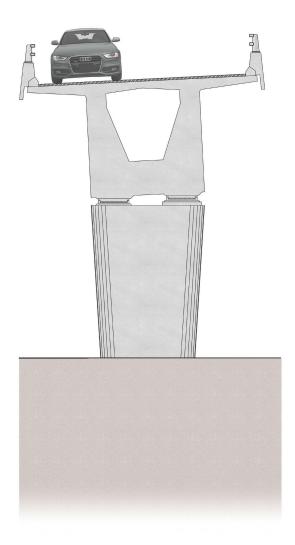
Cross section at pier of the flyover bridge (indicative concept design)
